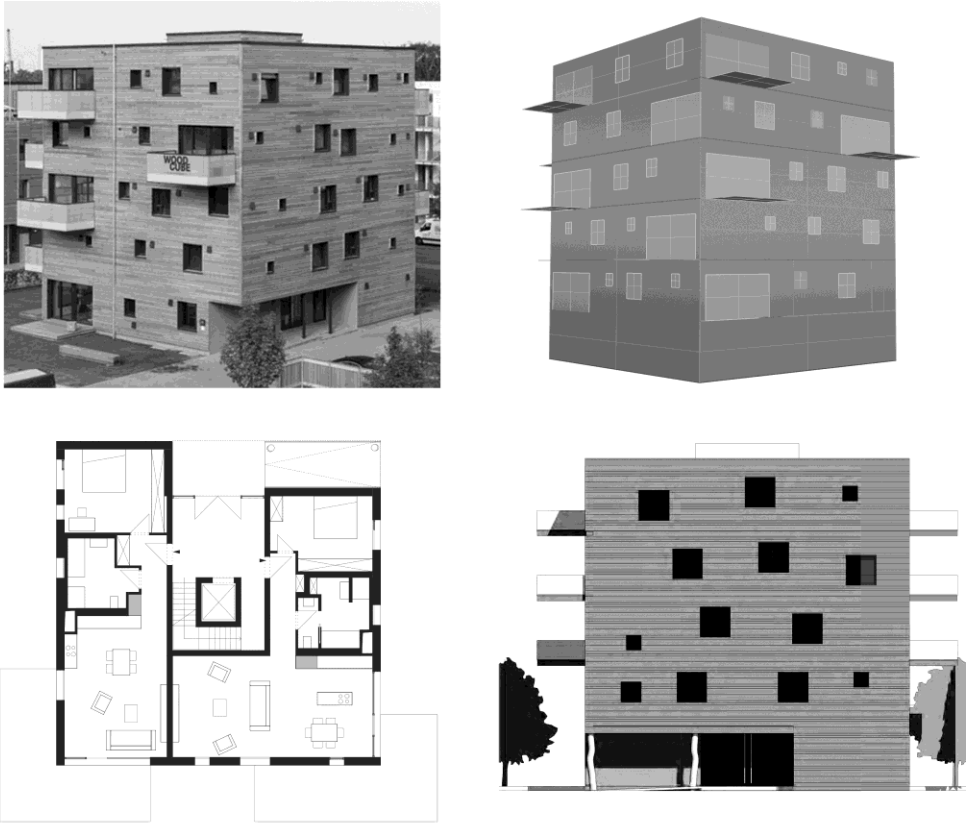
Top Left: WoodCube, north-east (www.iba-hamburg.de); Top right: simplified 3D model of the building, south-east; Bottom left: Woodcube, floor plan, ground floor (Hartwig, 2012); Woodcube, north elevation (Hartwig, 2012)
